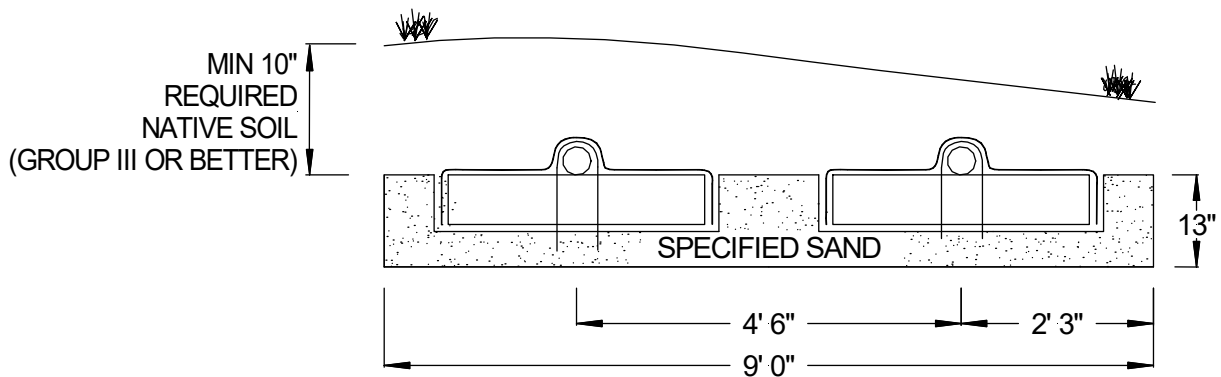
SECTION VIEW – B43 BED SYSTEM – SLOPING SITE
